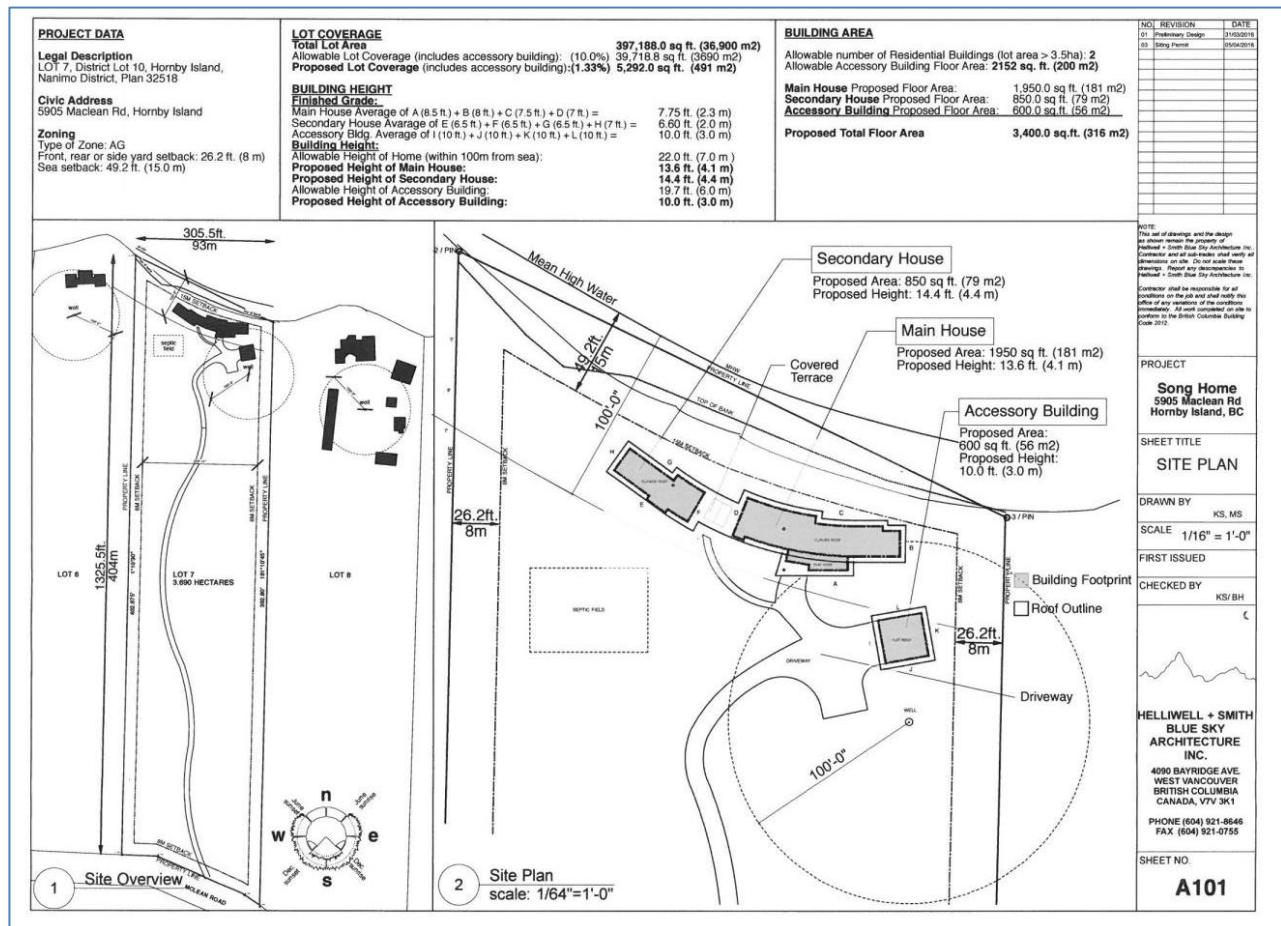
Proposed site plan for construction of two residences connected by breezeway
